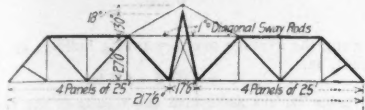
Grand Trunk Railway Bridge Across the Trent Valley Canal at Nassau, Ont. Central Bridge & Engineering Co., Peterborough, Ont., Builders.
